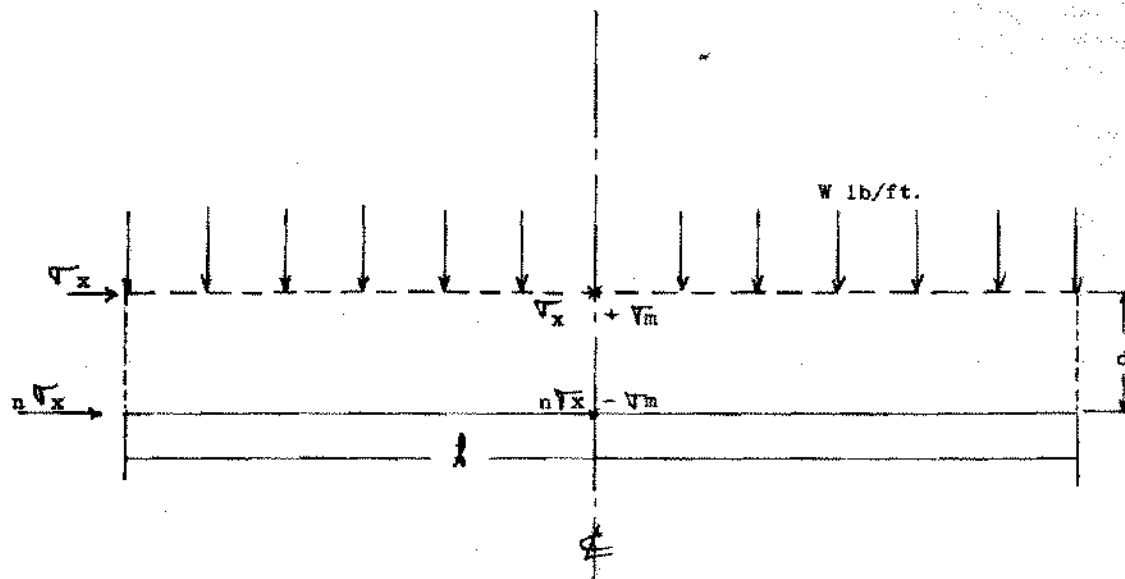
Uniformly Loaded Prestressed Beam-Column.
